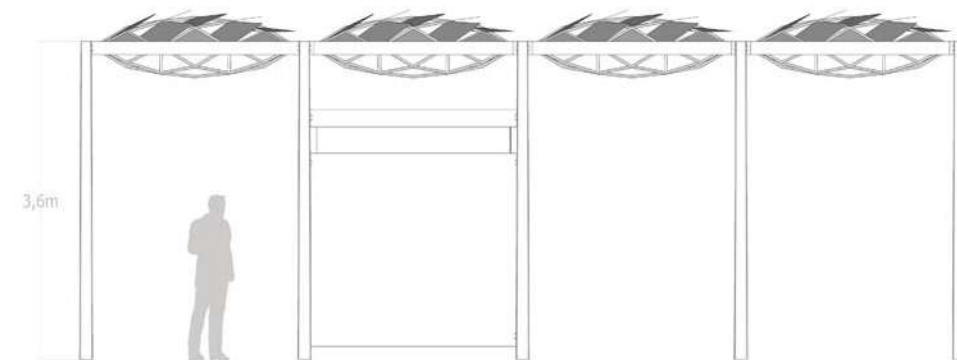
Modular shading structure with kiosk - side elevation showing unit elements
